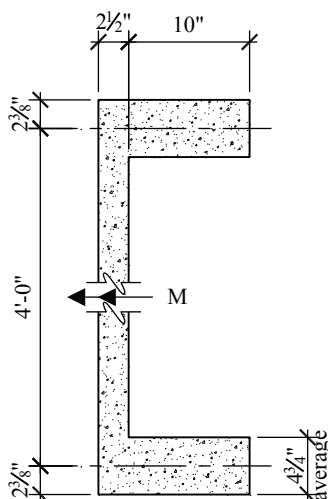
Cross section of the DT dry-packed at the footing
